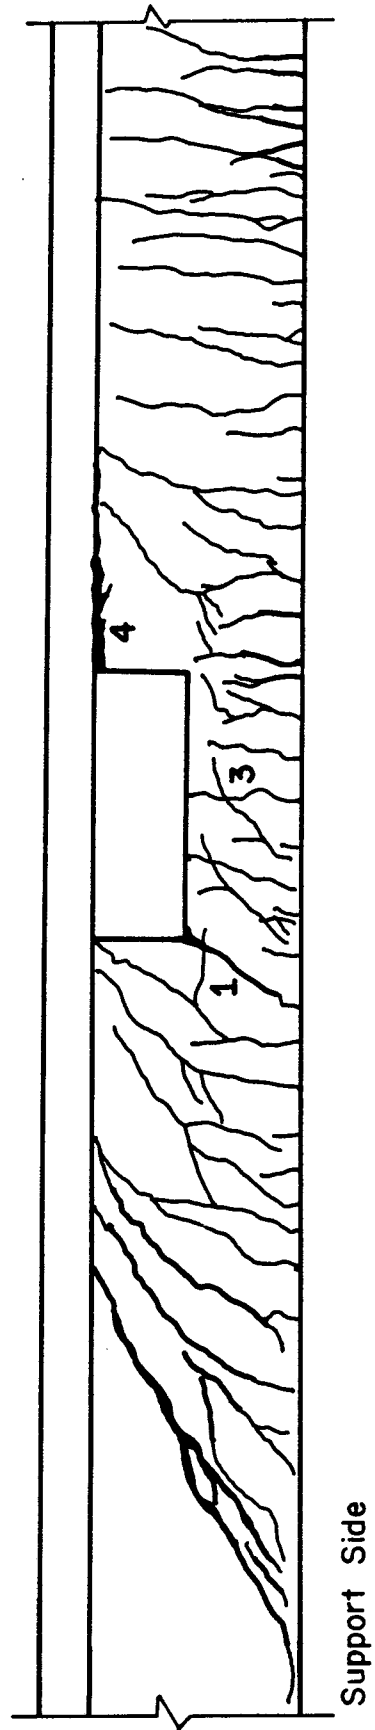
Crack Pattern - BEAM B3.
